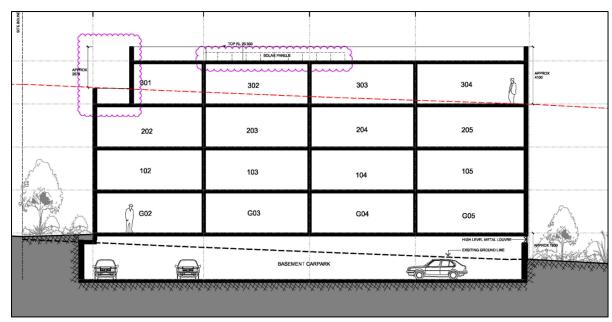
Extract of Section 3 showing exceedance in building height. (Original Plans)
